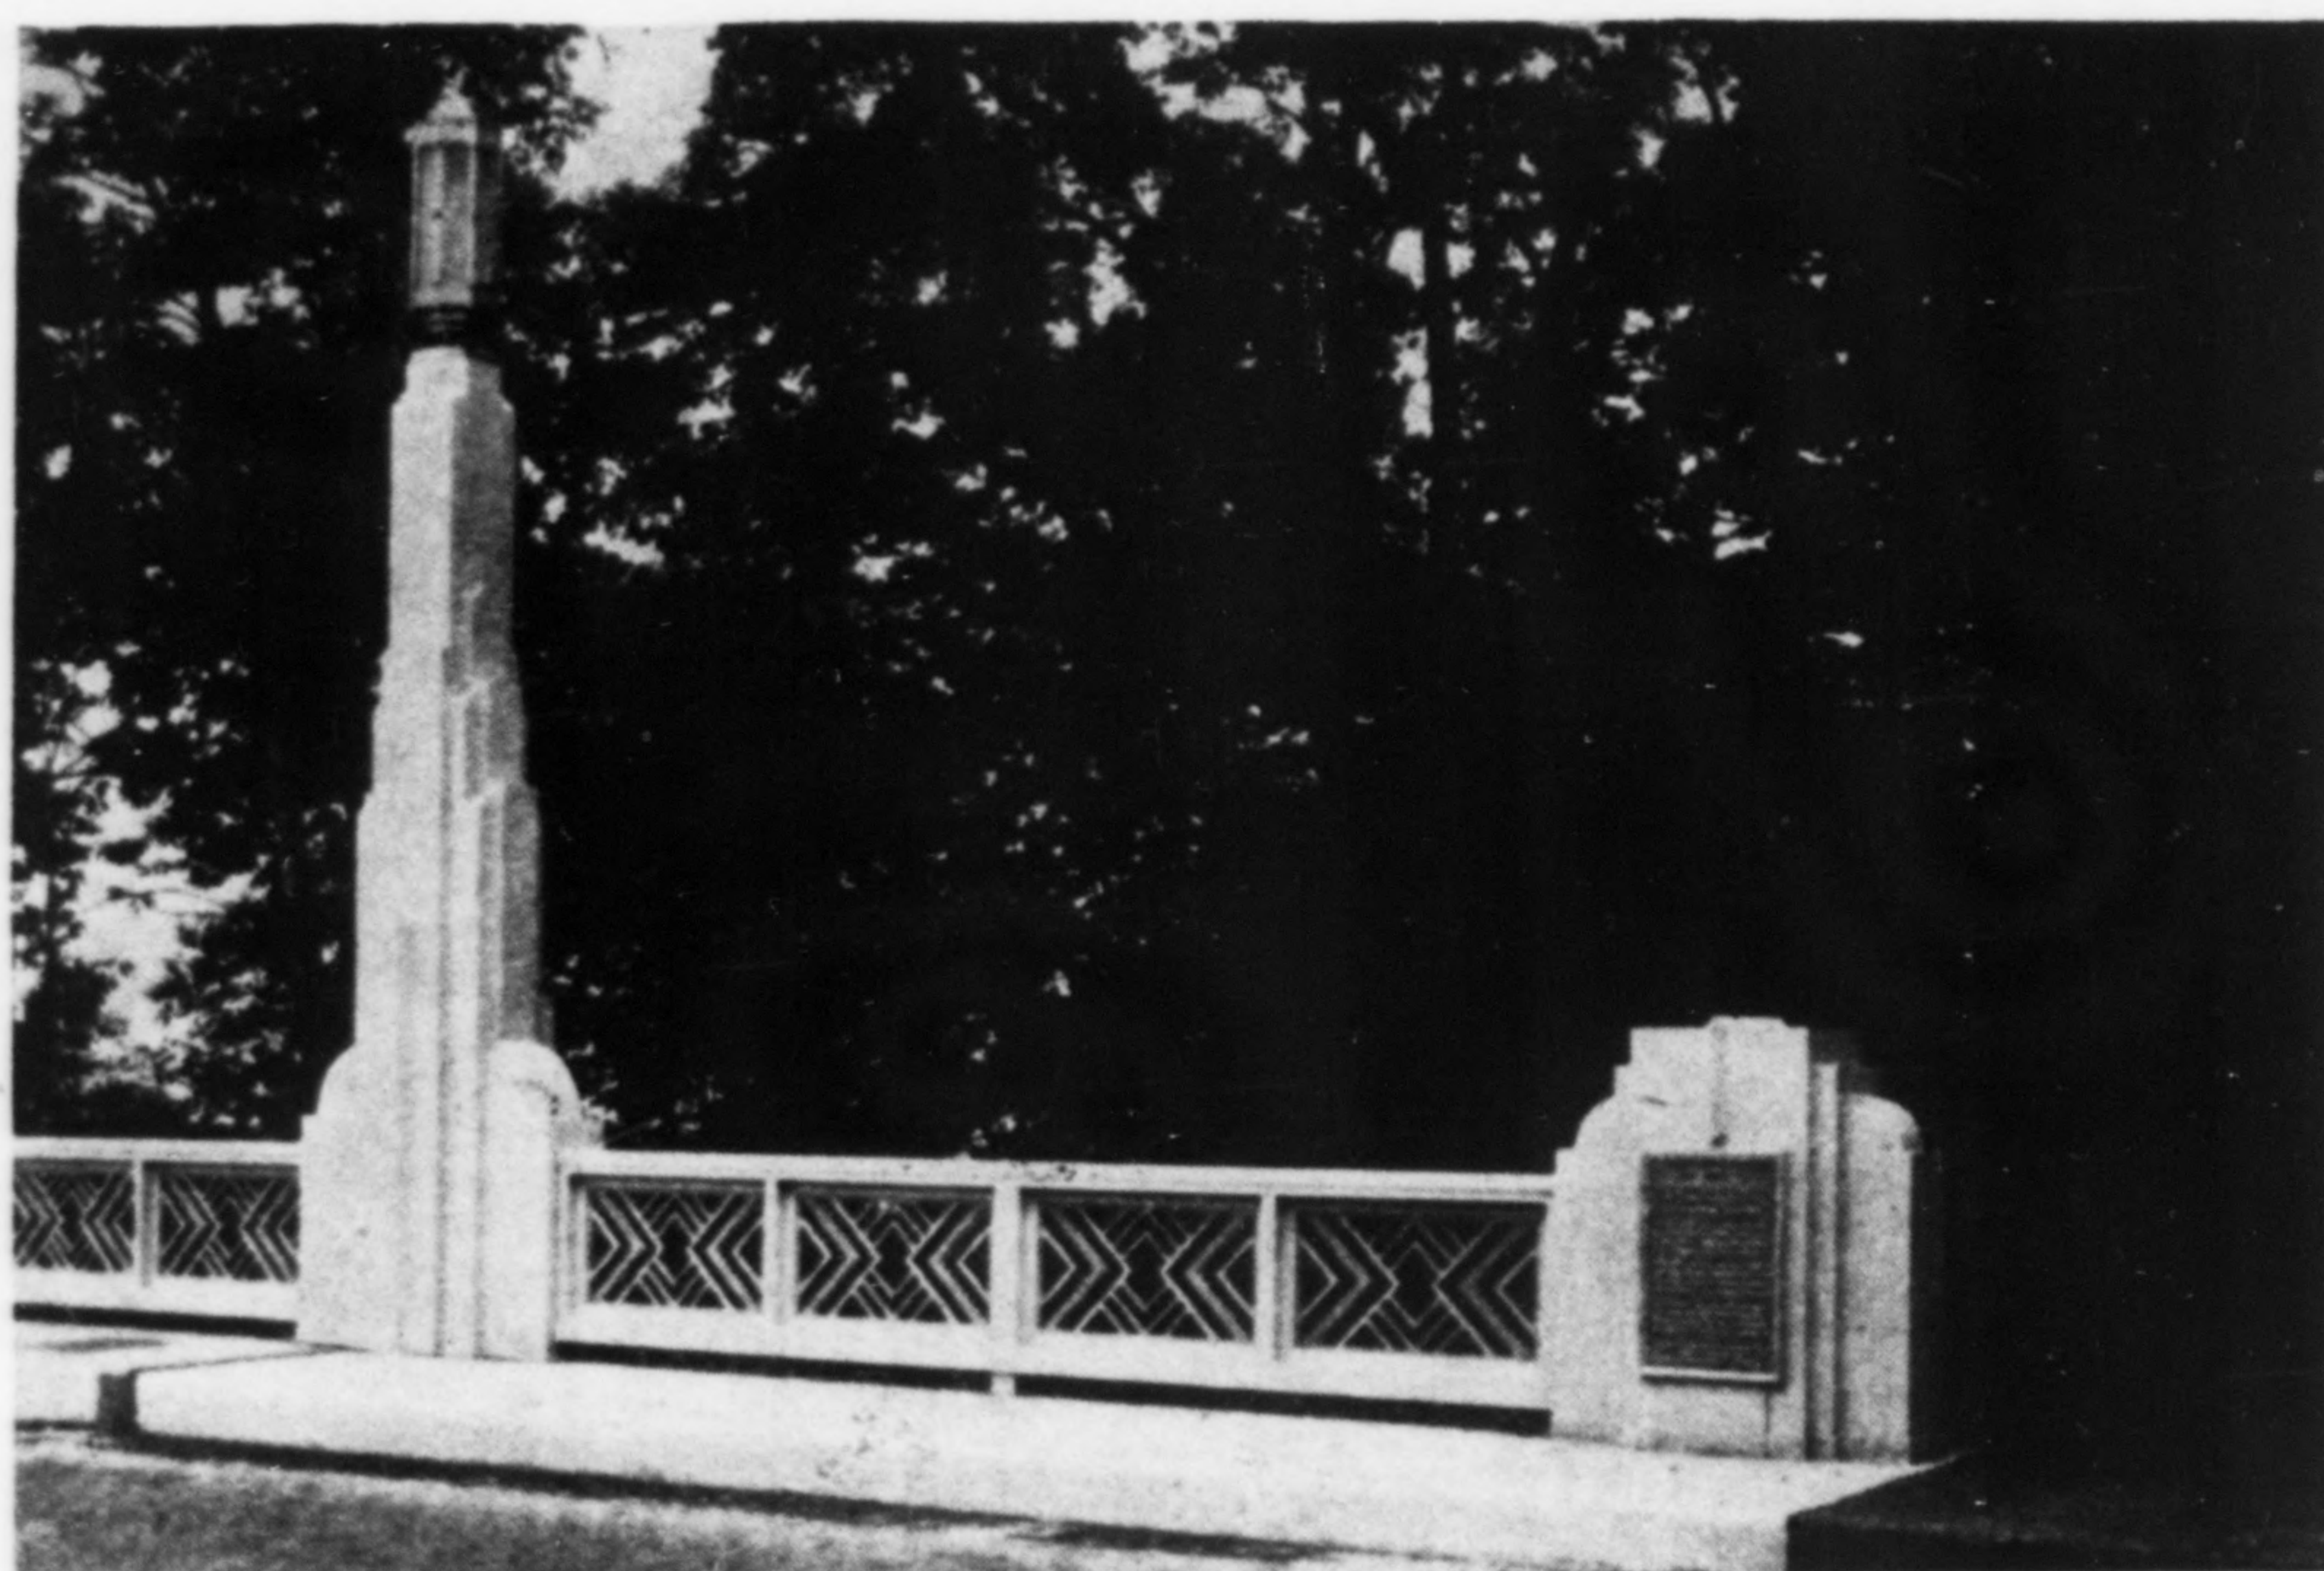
MODERNISM in steel construction as expressed in the pylons and railings of the Lorain Road Bridge.
